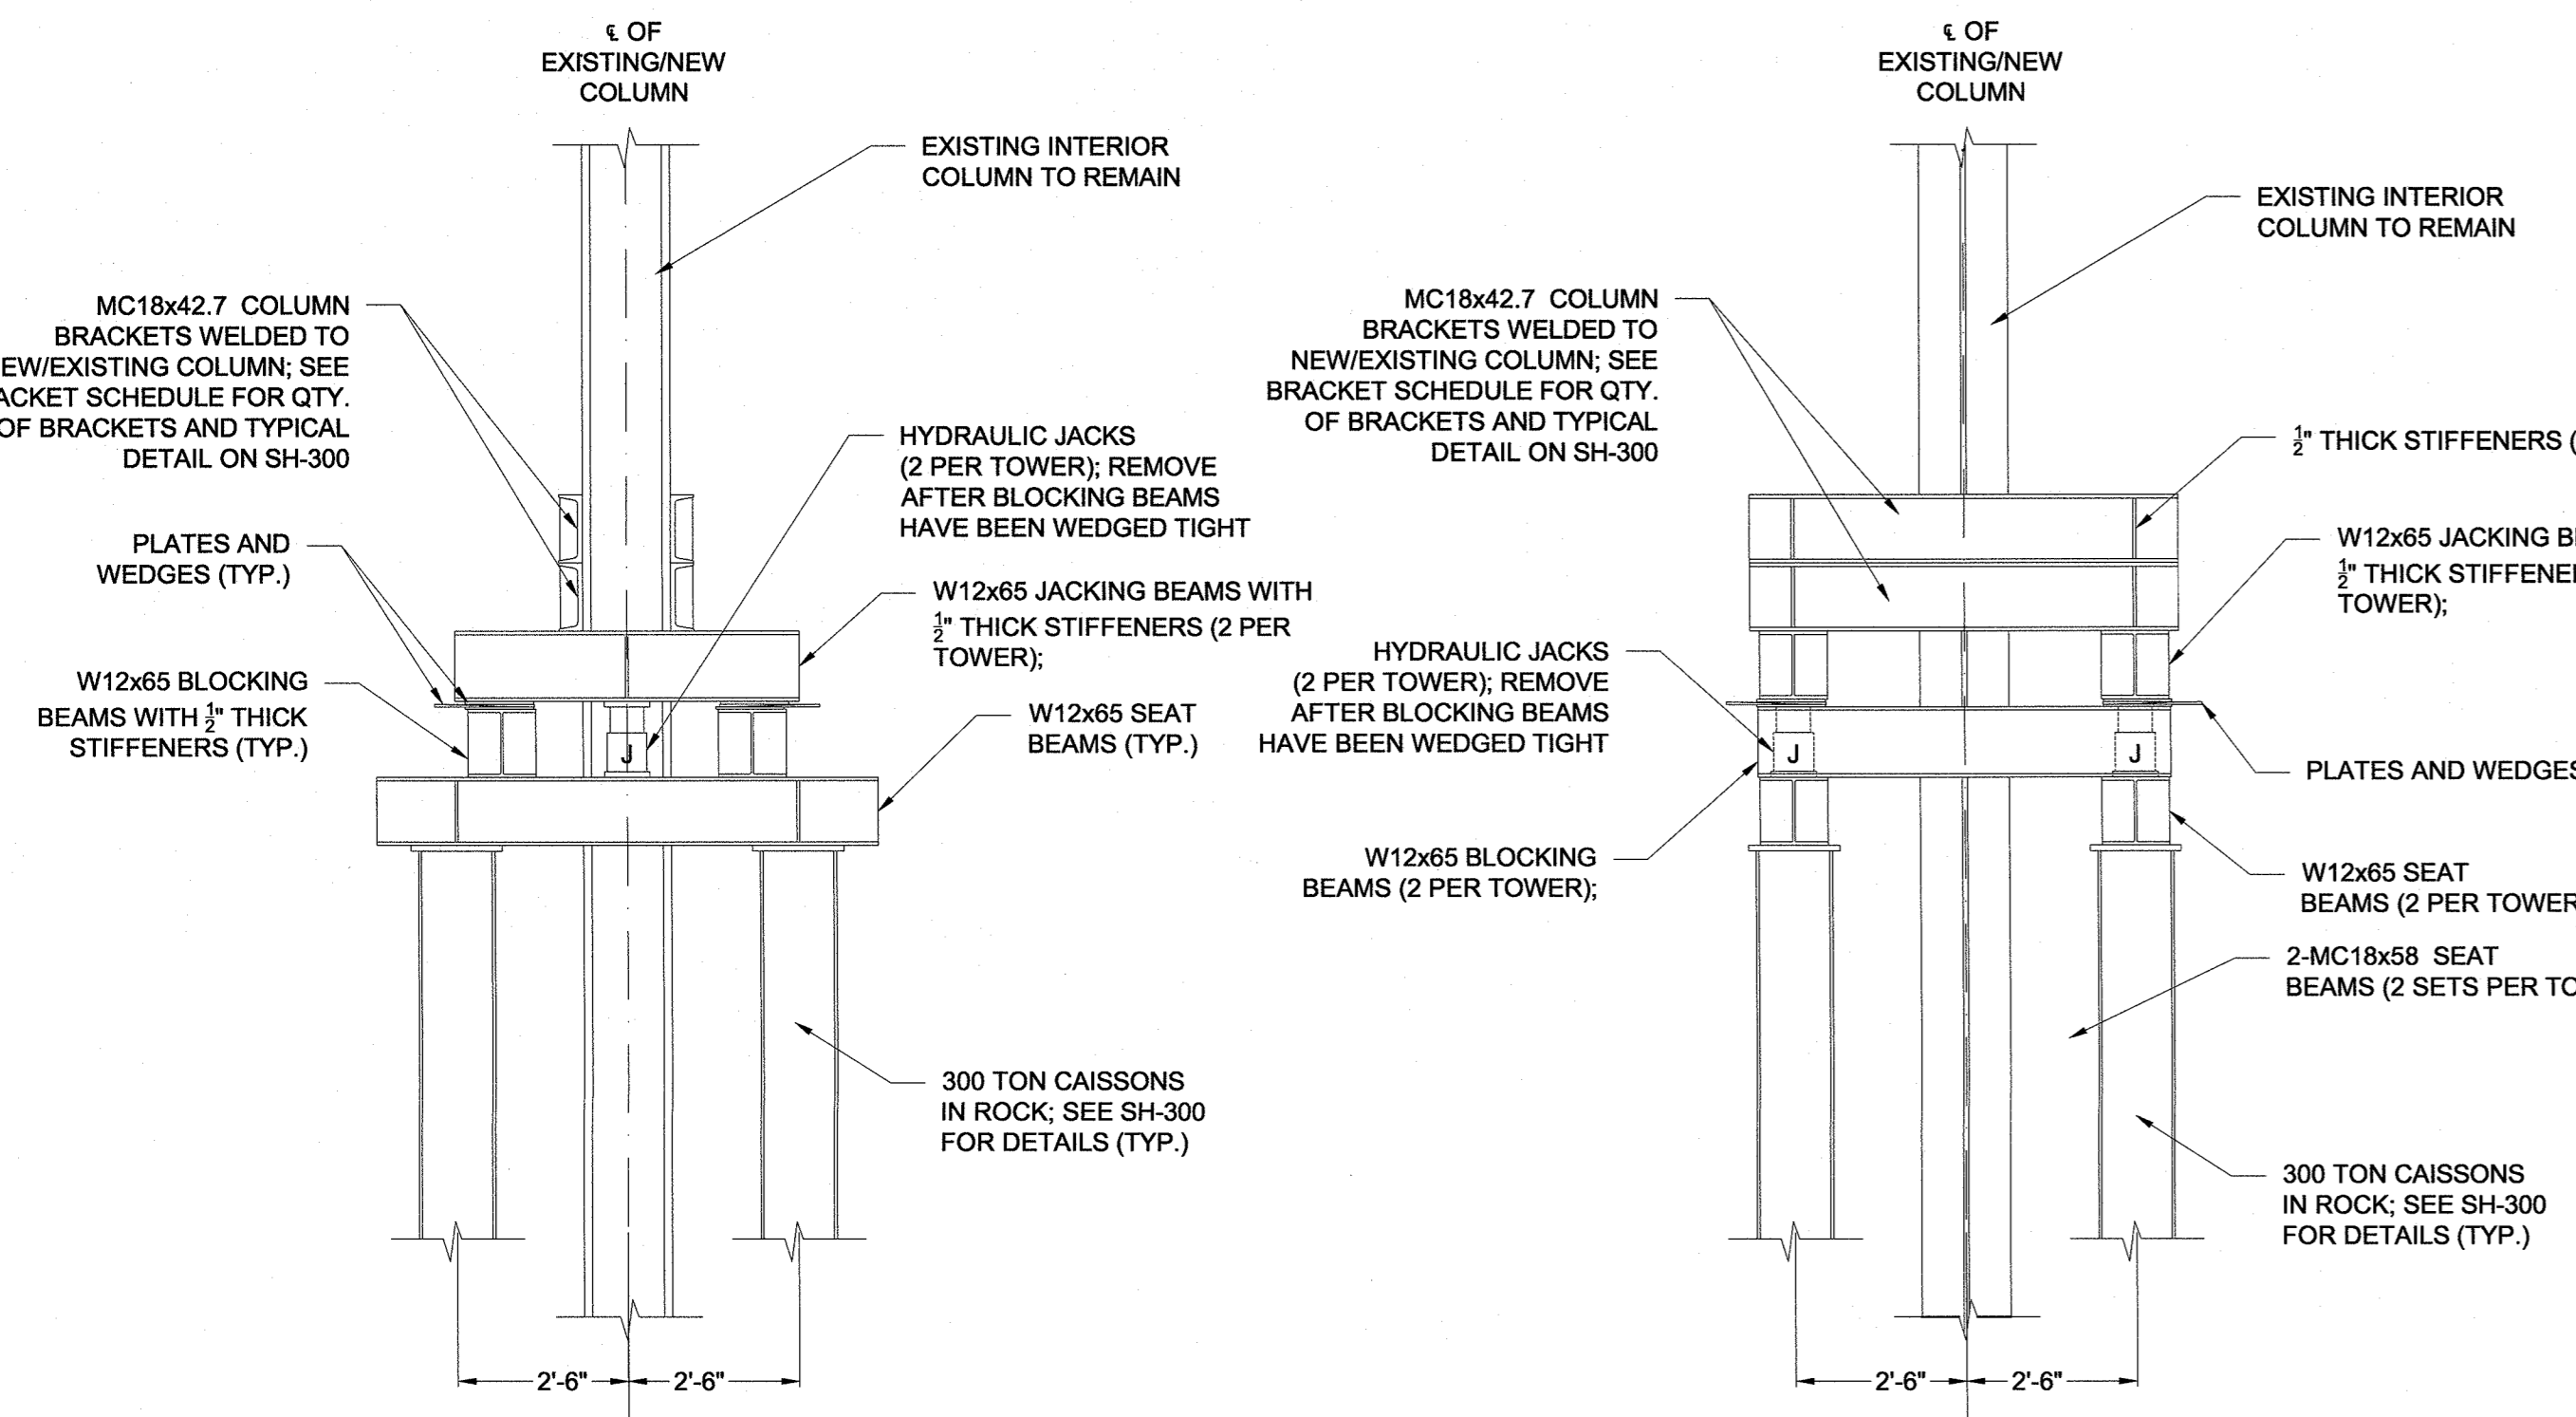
DETAIL "B" AT INT. EX. COL. (PHASE 2 SHORING)
